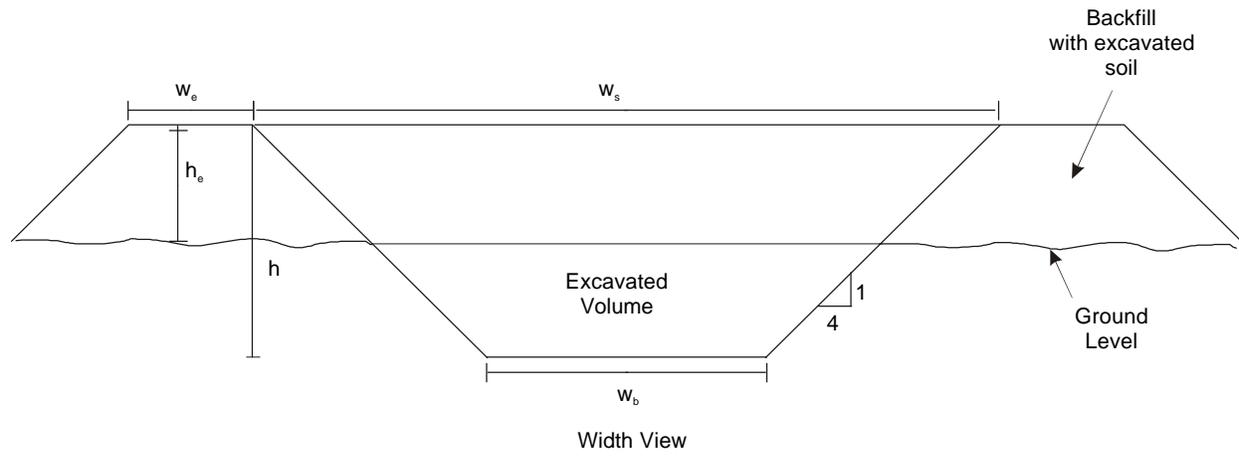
Cross-Section of an Earthen Basin
